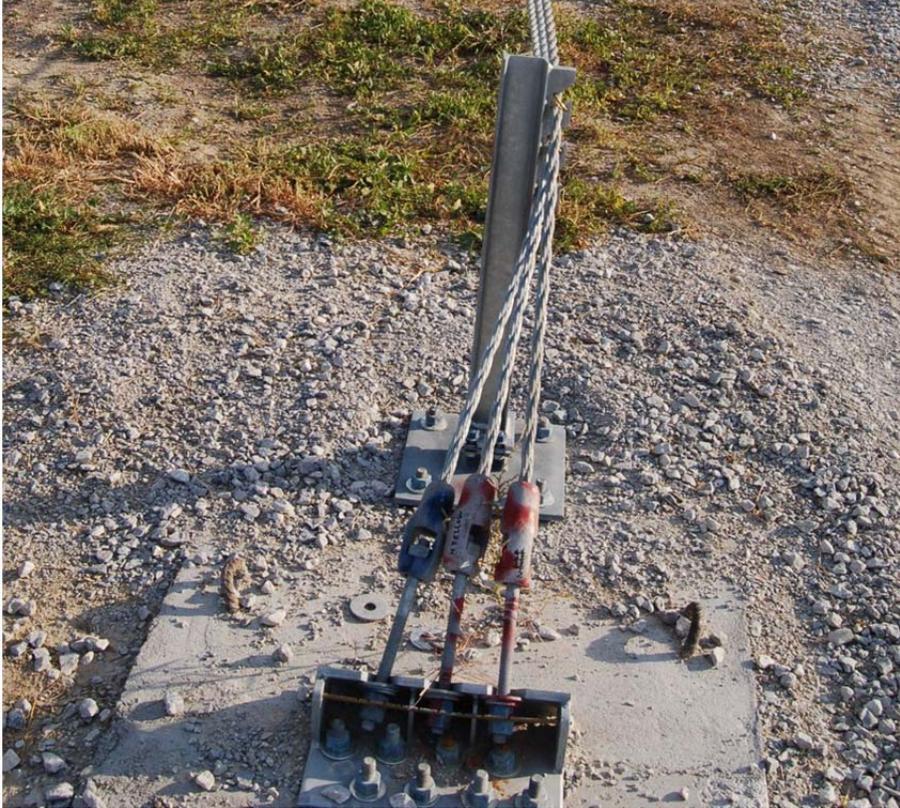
End Anchorage Photographs, Test No. NYCC-2
